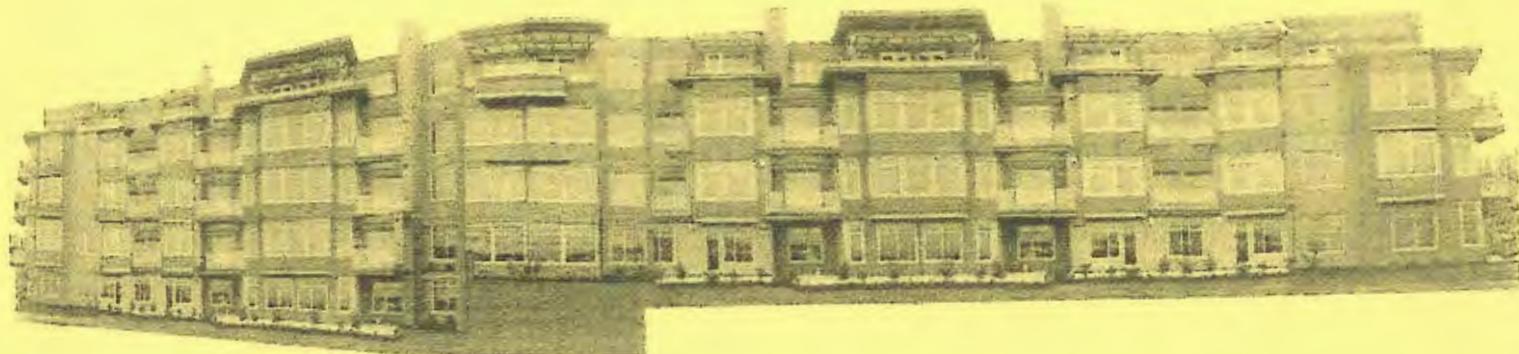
PHOTO COMPOSITE OF PROPOSED BUILDING 10 - MODIFIED ROOF PLAN
